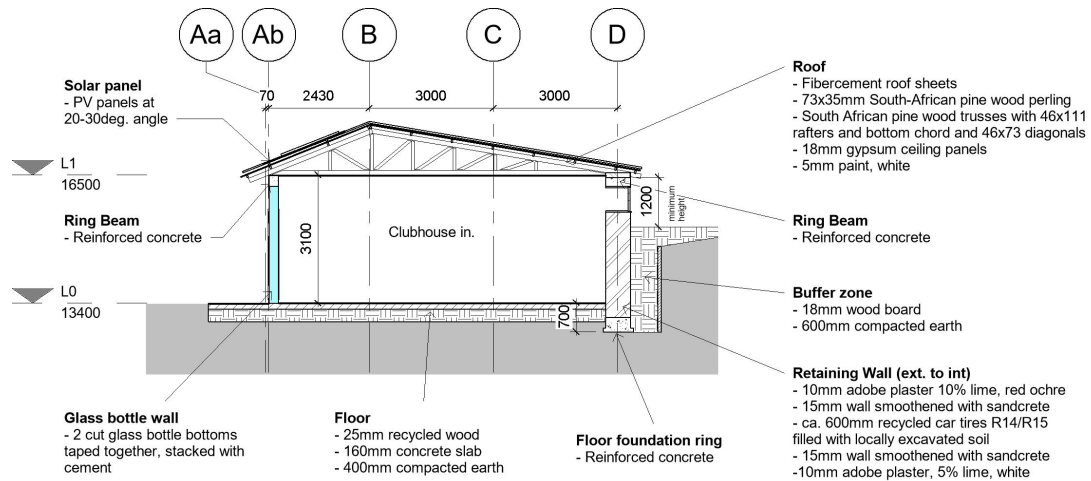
Building section: clubhouse inside, original file scale 1:100
